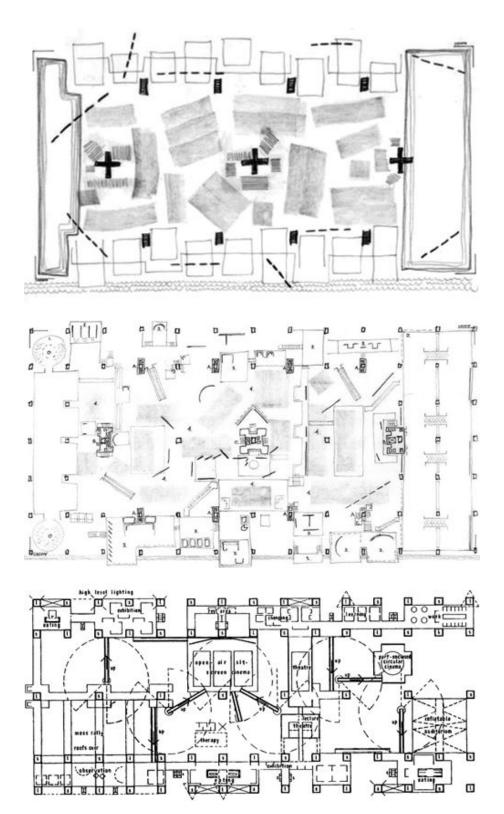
Open ended diagrammatic floor plans, The Fun Palace, conceptual plan -> working plan -> final plan [Cedric Price /
